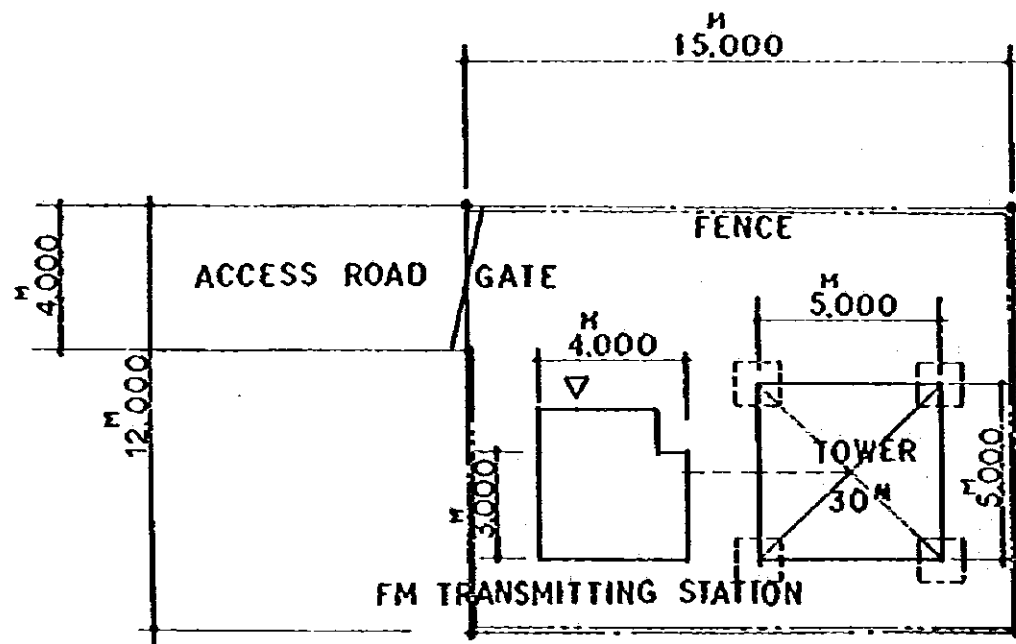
SCHMATIC DIAGRAM AND FLOOR LAYOUT OF BT. SEMBILAN STATION
